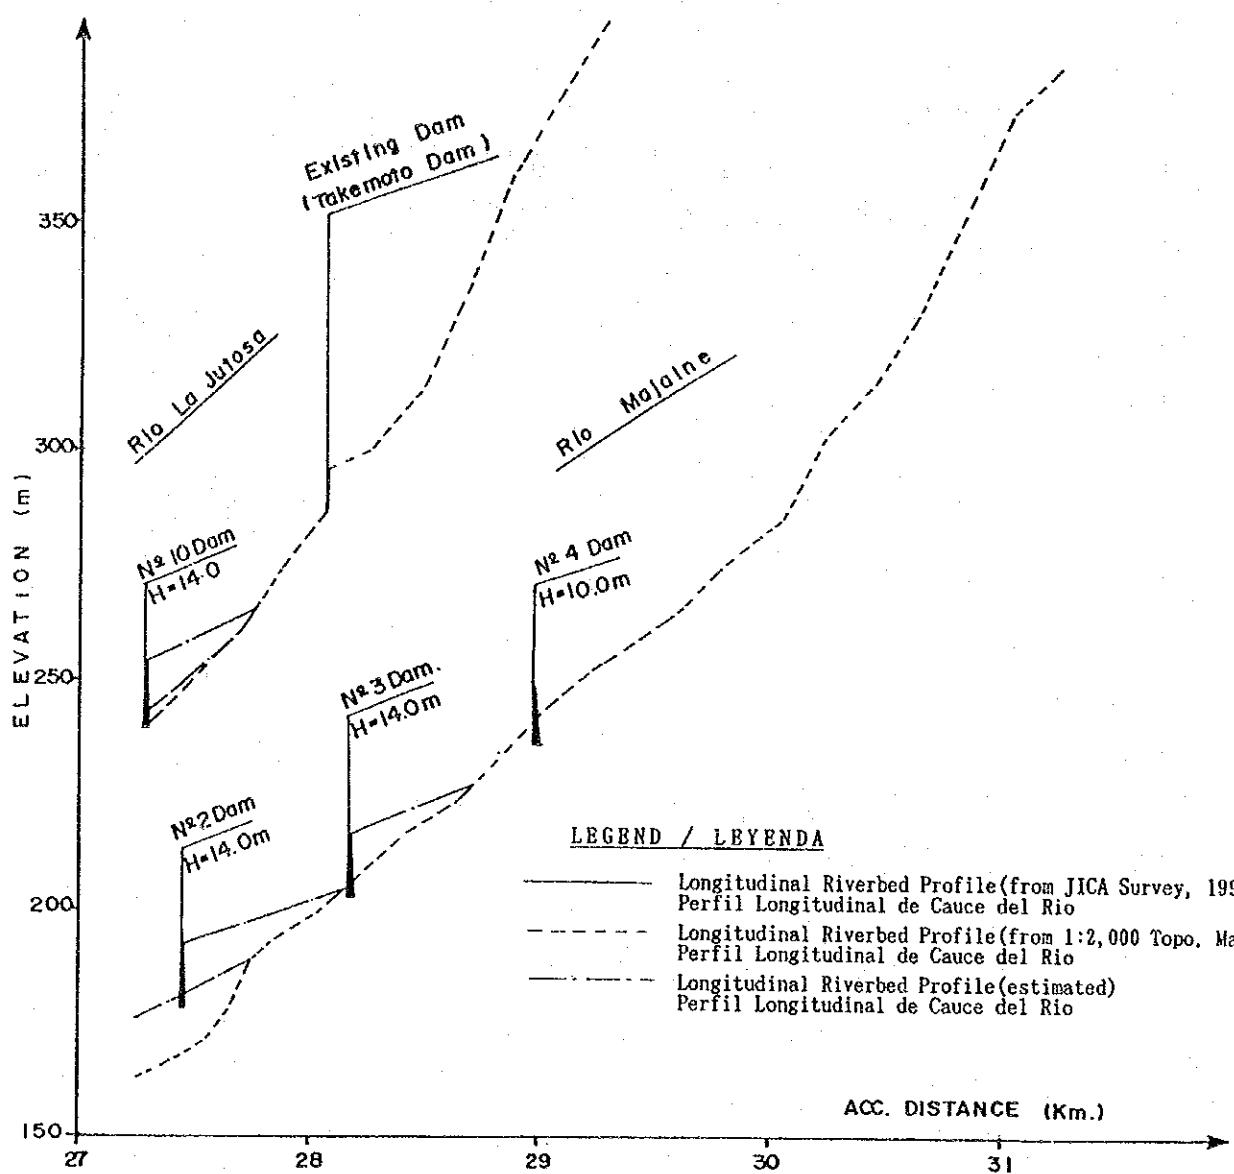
(2) DESIGN LONGITUDINAL SECTION OF EROSION CONTROL FACILITY
